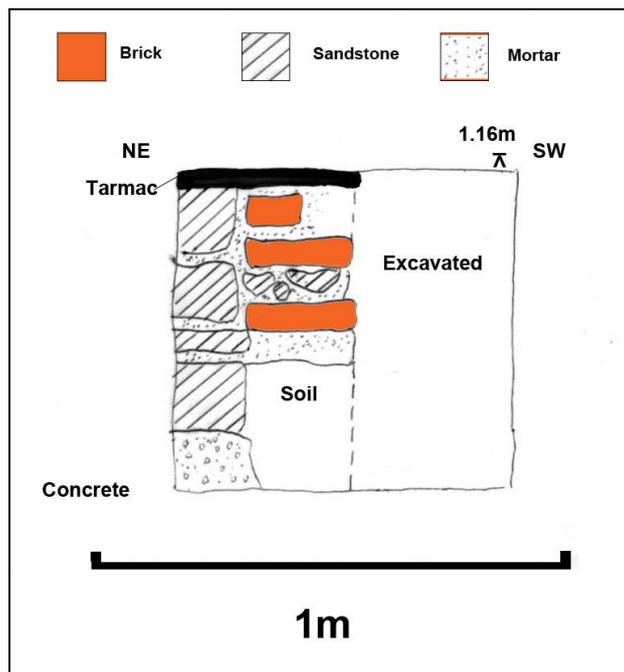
Section drawing of wall foundation [100] in pipe trench 1 drawn at 1:10
